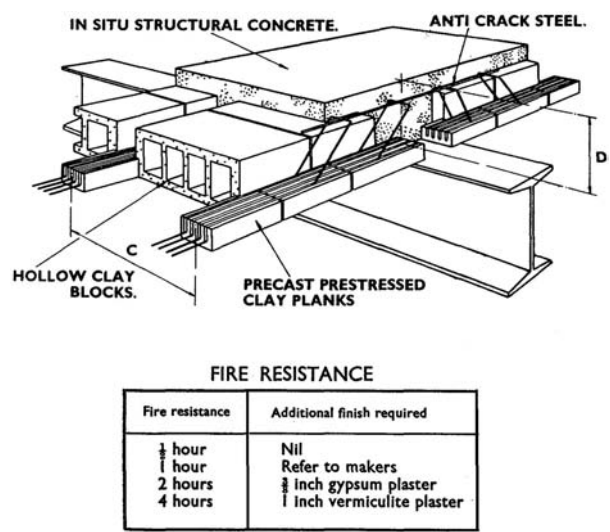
Empirical approach to achieving fire protection. [Source: British Constructional Steelwork Association.]
